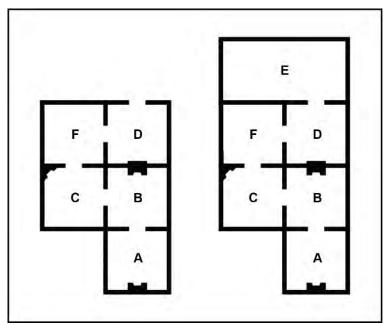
Third Possilbe Floor Plain. The footprint of the Finley House with room "A" connected on the plan on the left, and in the plan on the right, a final addition made with room "E" (at top of plan) and F.
